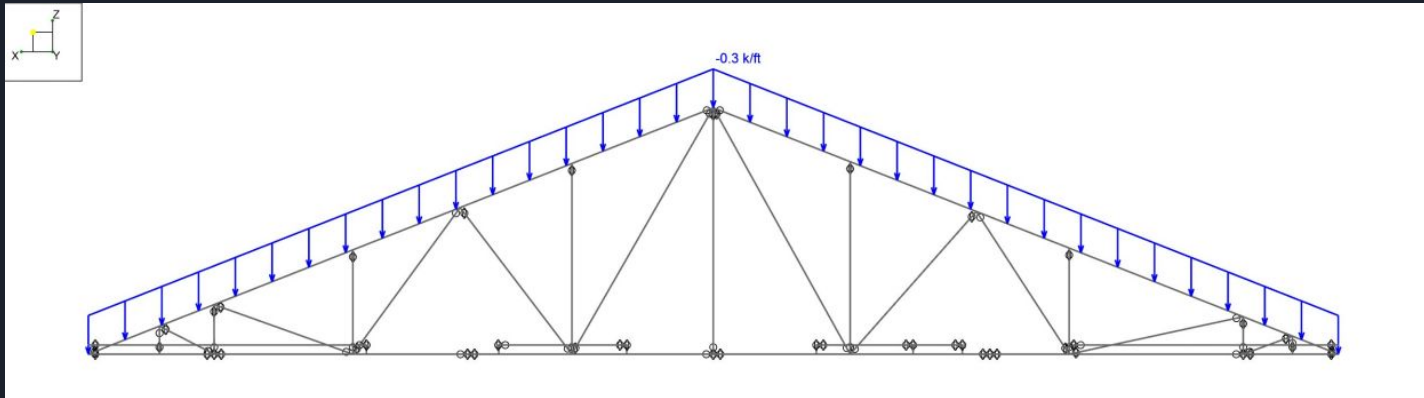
Profile View of Roof Truss w/ Roof DL [7]
